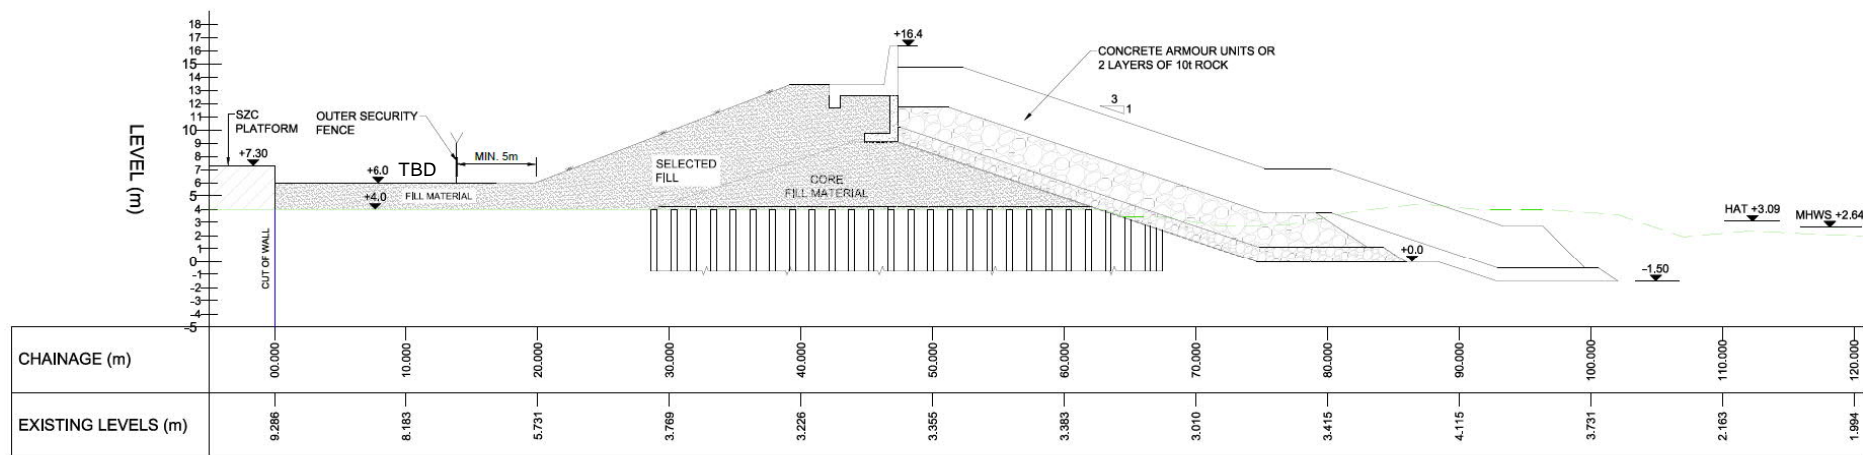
Proposed Permanent HCDF cross-sectional profile (extract from EDF Energy drawing no. SZC-EW0601-XX-000-DRW-400025 rev. 01, 27/11/20)
